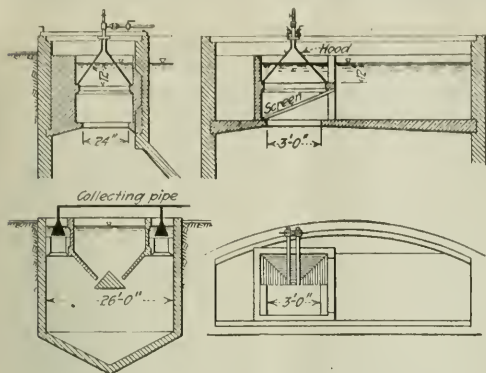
DETAILS OF GAS HOODS AND PIPING
